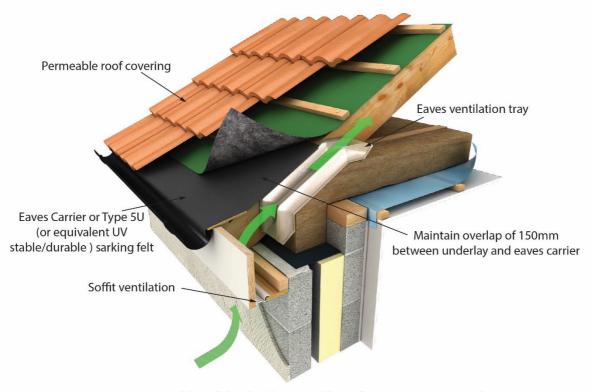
Cold Roof detail with permeable roof covering - Eaves Detail
